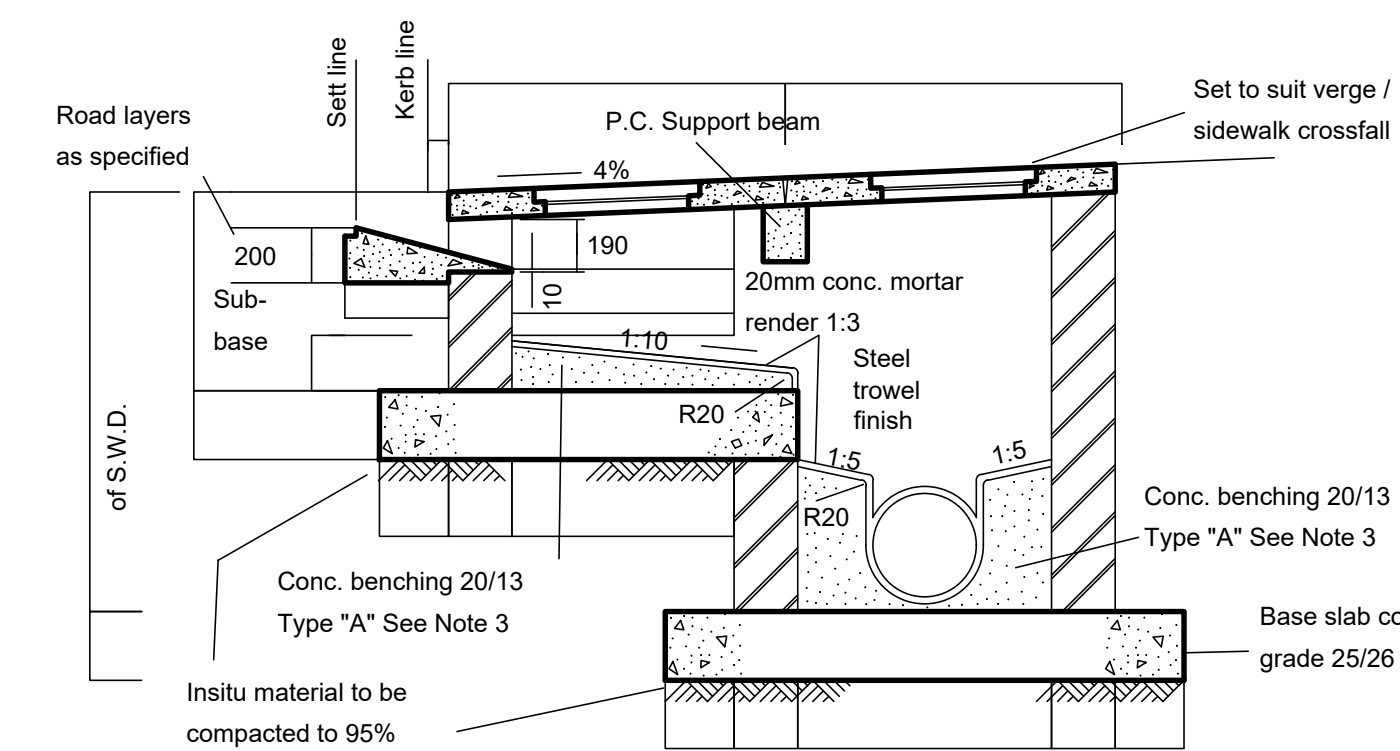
DETAILS OF INLET / MANHOLE AFFECTED BY ROAD WIDENING
